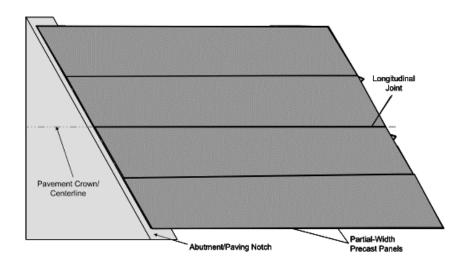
Partial-Width Full-Length Precast Concrete Approach Slabs
